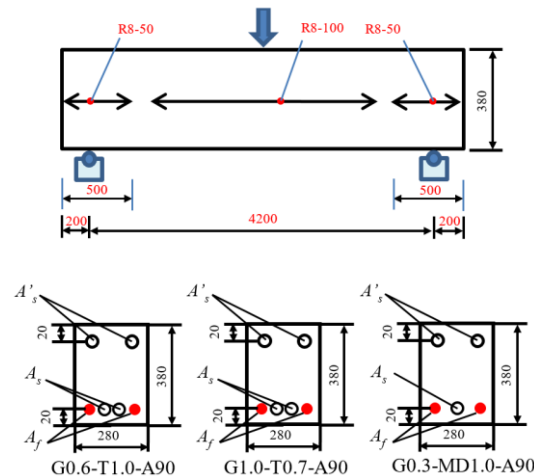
Geometrical dimension of the group tested beams (Lau and Pam 2010)
